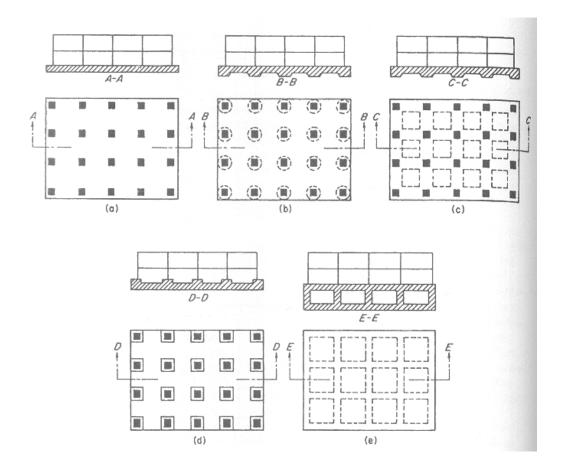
Examples of mat foundations (a) Flat plate; (b) plate thickened under columns; (c) beam- and-slab; (d) plate with pedestals; (e) basement walls as part of mat
